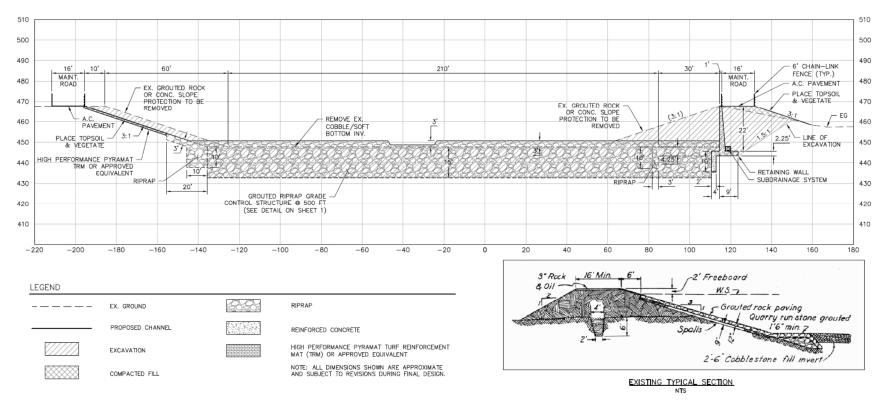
Cross-Section 2, Midpoint Bette Davis Park to Upstream of Ferraro Fields
